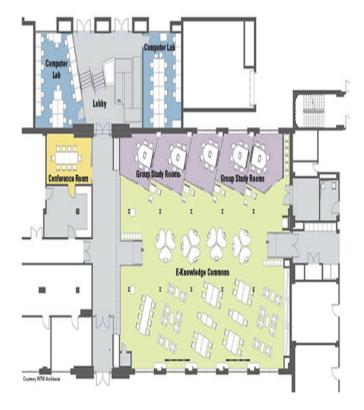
Gusharney Family Commons & Reber First Floor Plan
